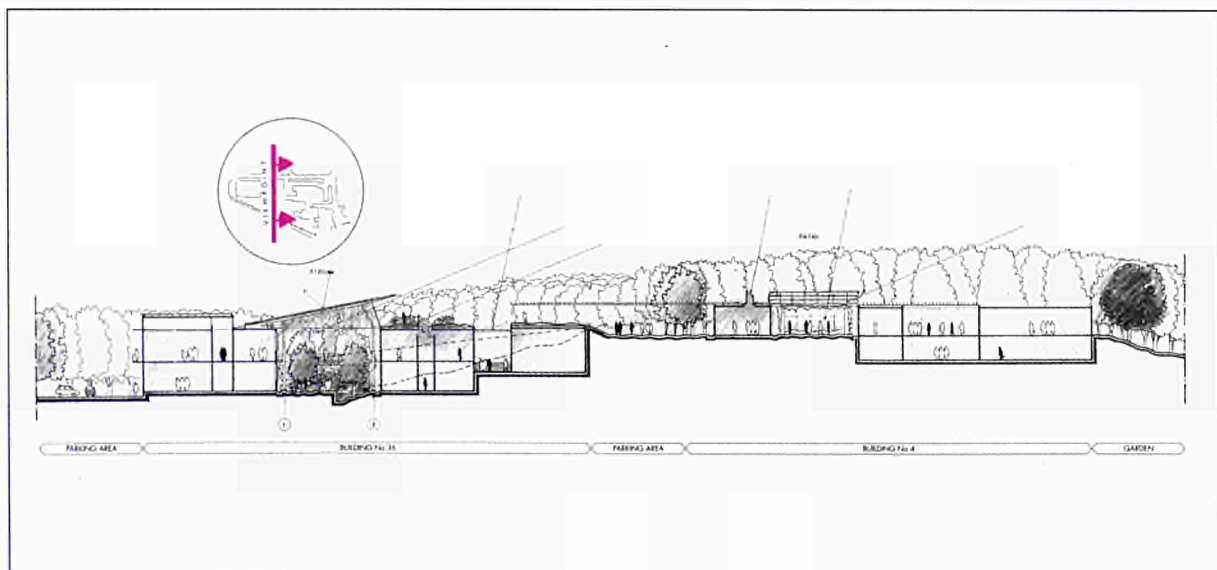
A Winning Design for the Retrofitting of a Building
